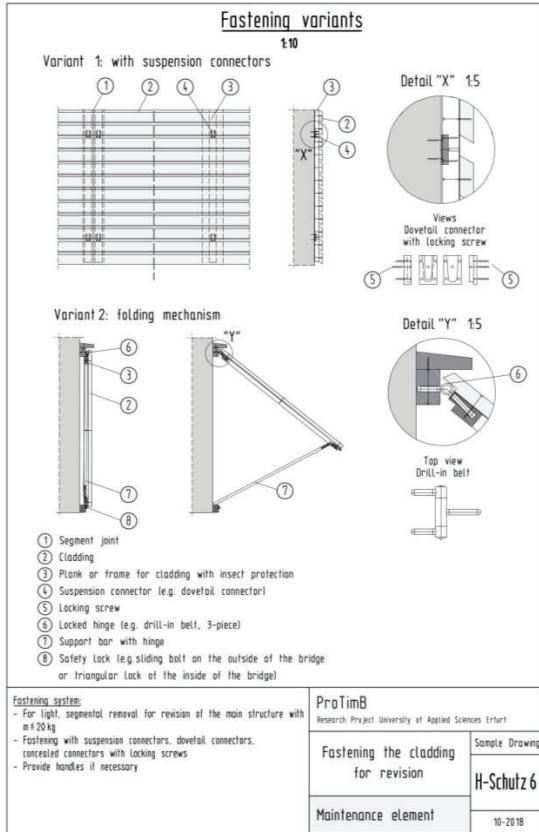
Sample drawing H-Schutz 6 showing a removable cladding for inspection
